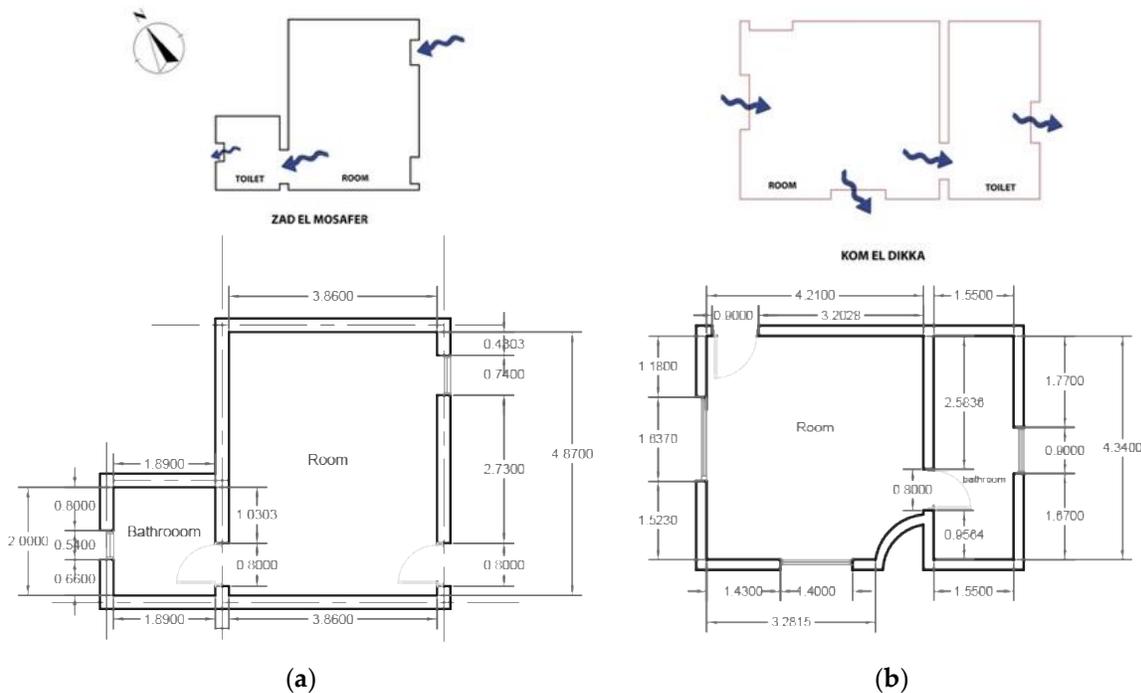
Zad El-Mosafer studied room plan that shows wind direction coordination & detailed room dimensions; (b) kom El-Dikka studied room plan that shows wind direction coordination & detailed room dimensions.
